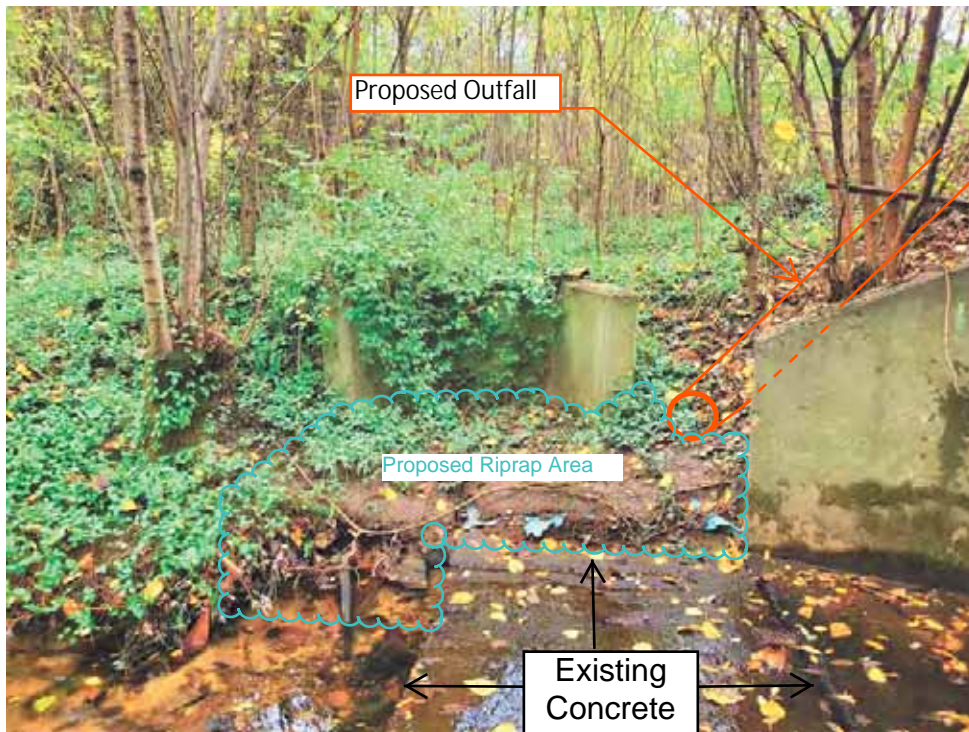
Investigation Area 1; view of the southeast quadrant of the US 31 crossing of UNT to Silver Creek; proposed new storm water outfall and riprap area noted
